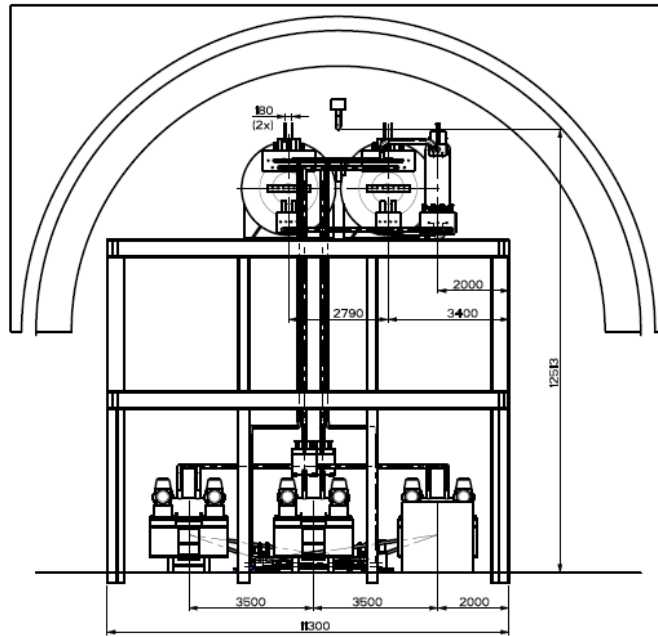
Transversal elevation view of of the pipeline system set up connecting pumps with cylindrical tanks
